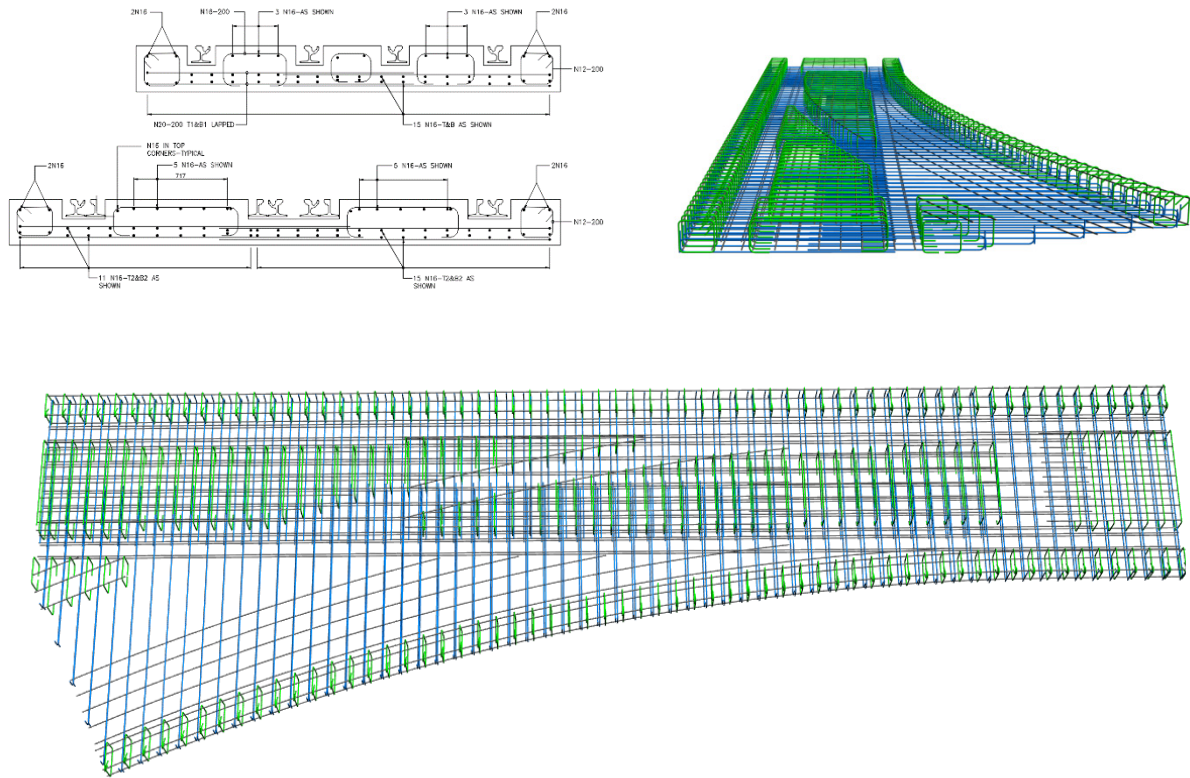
Turn-out typical cross-sectional reinforcement and typical bar placing
